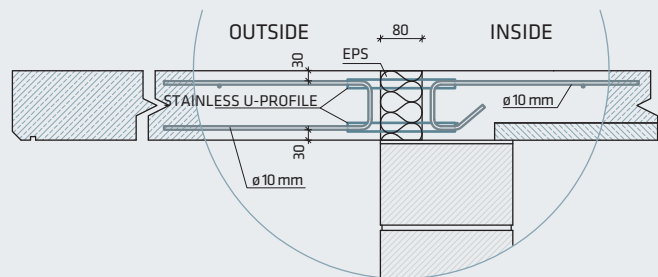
Cantilevered balcony slab with TKM G-E rib
